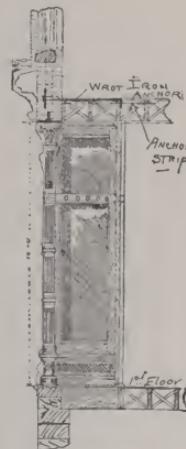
SECTION OF FRONT OF STORE, SHOWING ANCHORS, STRIPS, BEAMS, ETC.
